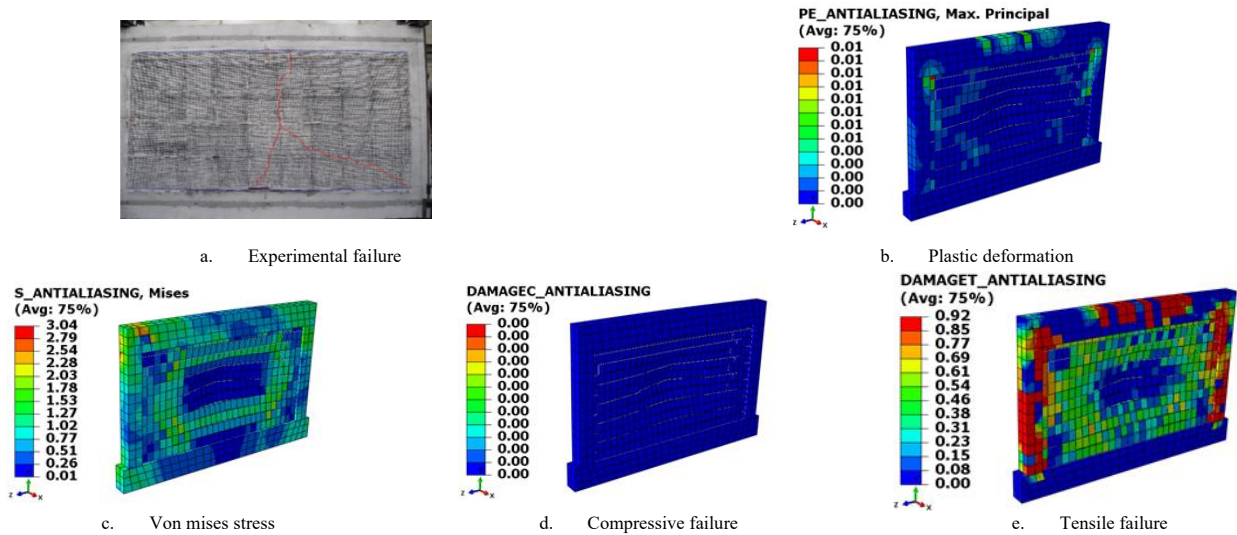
Damage and deformations of the reinforced concrete frame specimen under out-of-plane loading.
